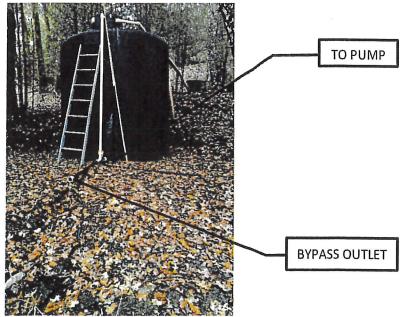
Spring diversion storage tank and bypass/overflow infrastructure
